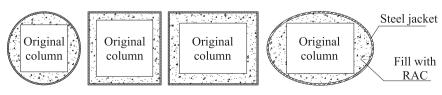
Various cross-sections of steel-jacket retrofitted columns with RAC.
